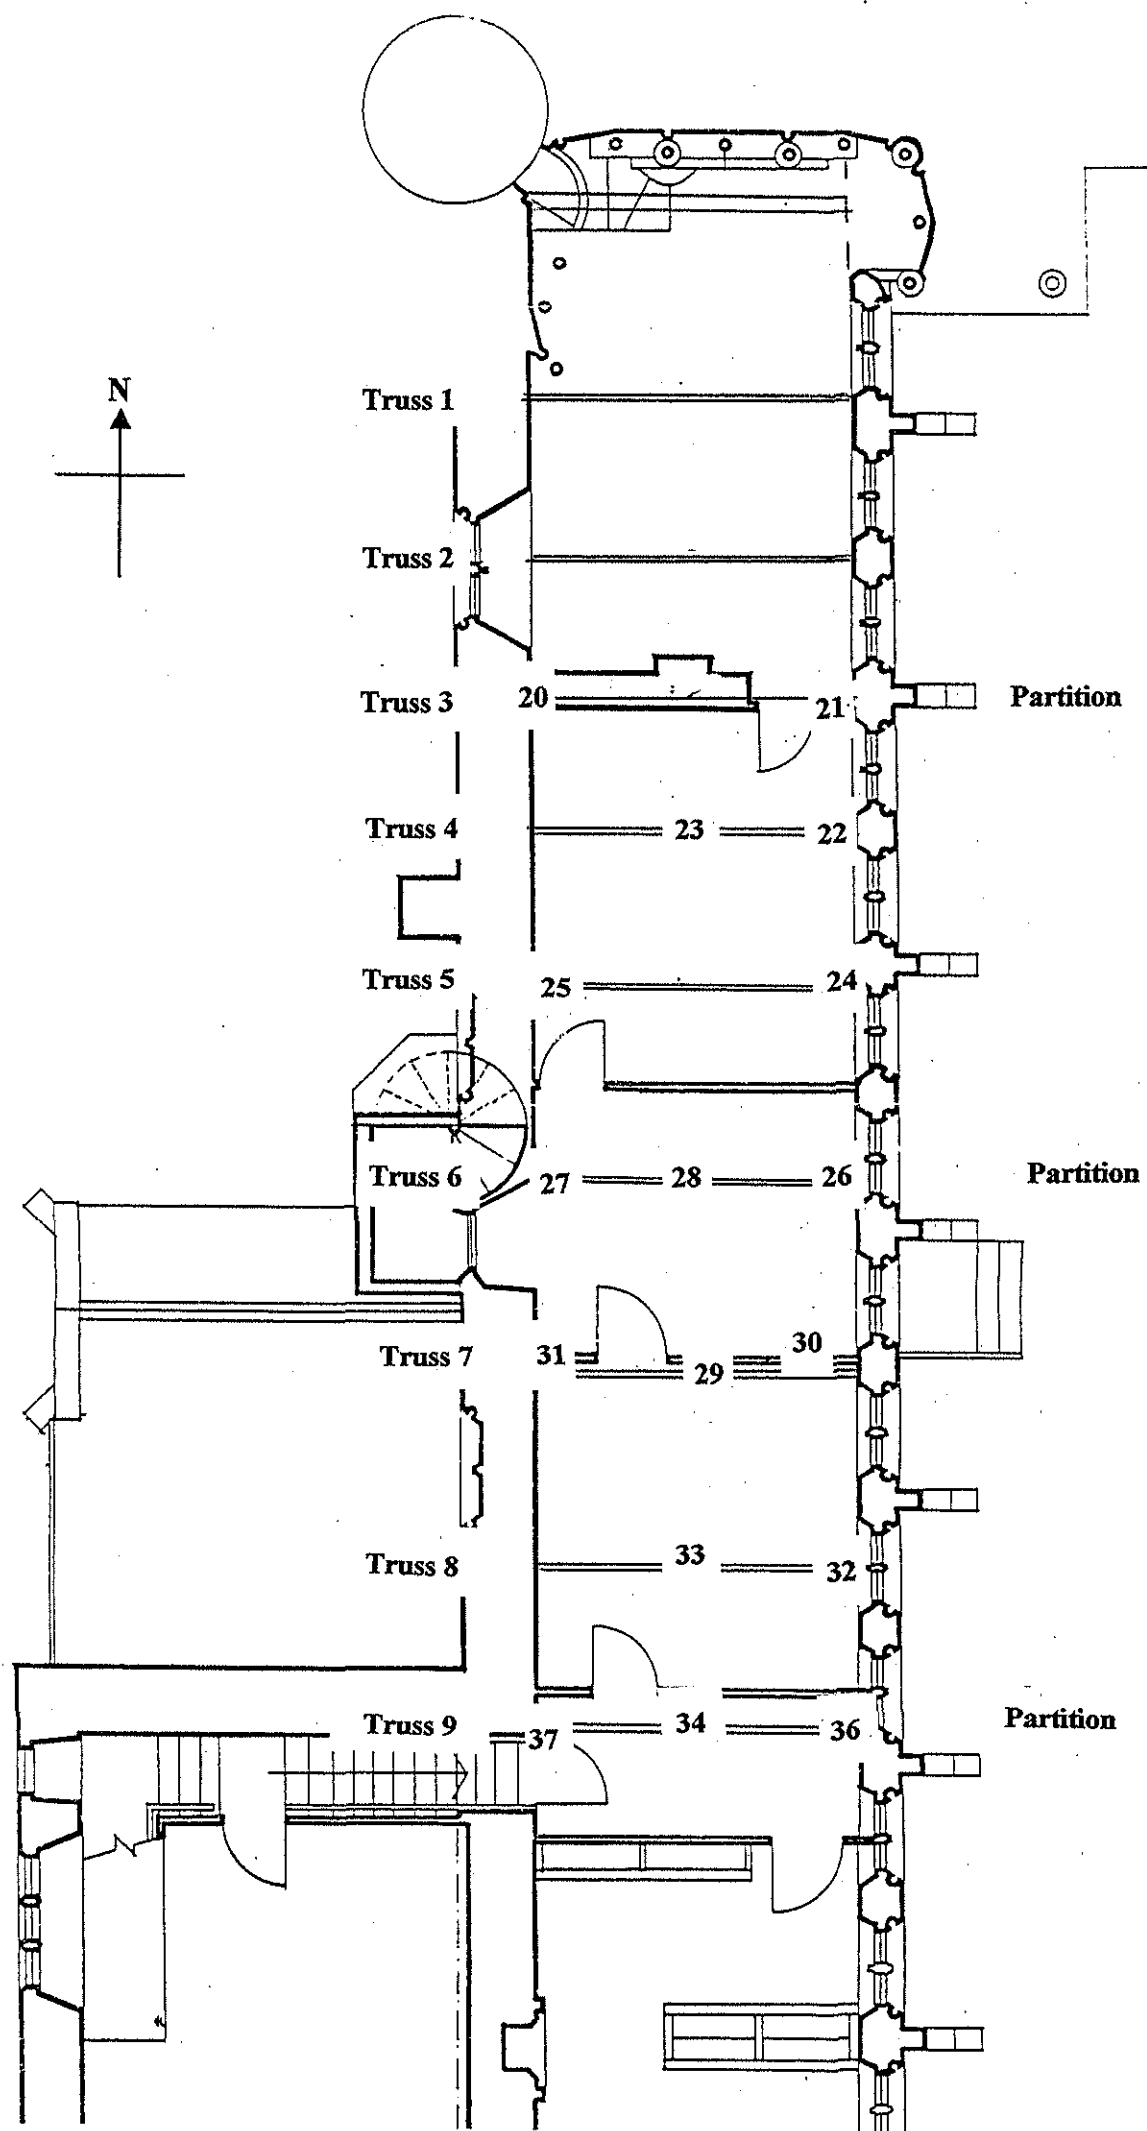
Plan of the roof of the west cloister, trusses 1 – 9, to show sample locations
